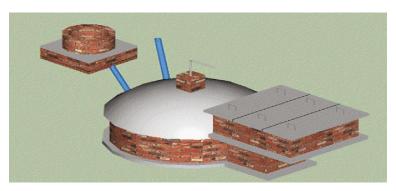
Biogas digester with a mixing pit and slurry outlet.
